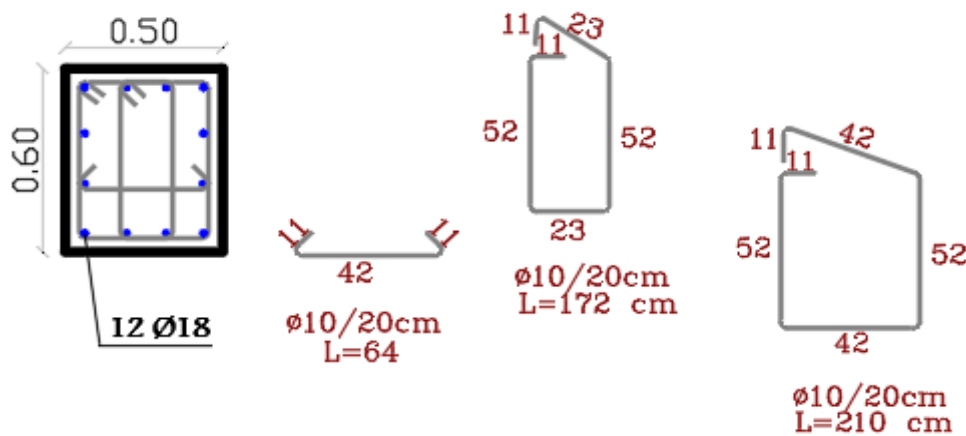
C10 REINFORCEMENT DETAILS
